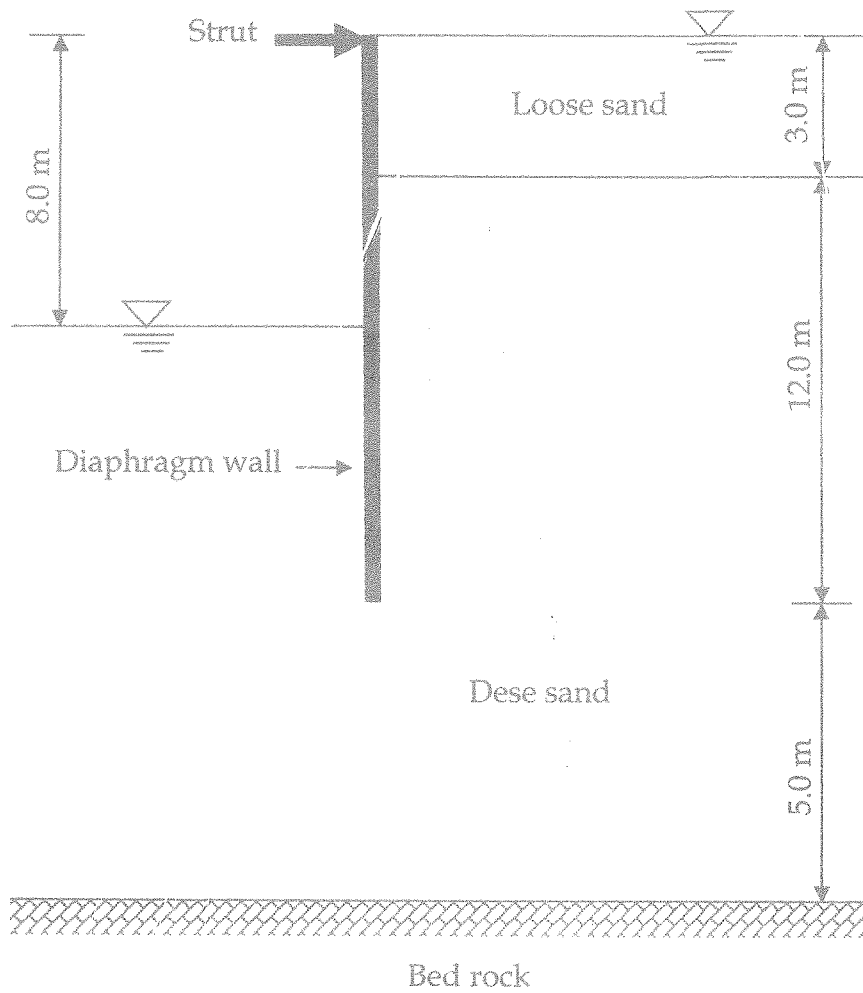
Subsurface soil profile at the diaphragm wall construction project
